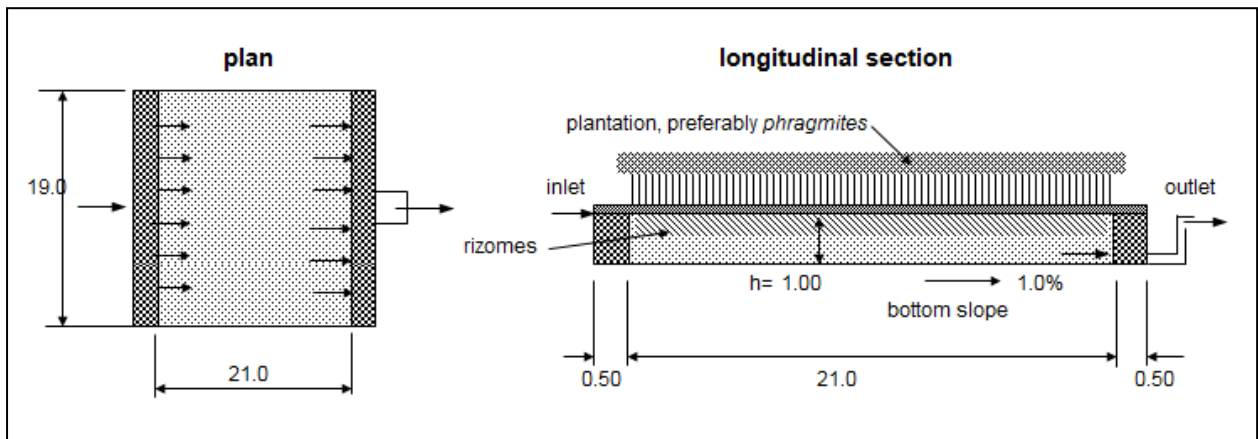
Longitudinal section and plan of proposed Horizontal Planted Gravel Filter
